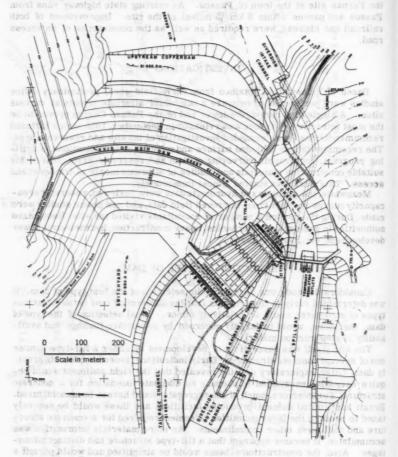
GENERAL PLAN OF FURNAS PROJECT
